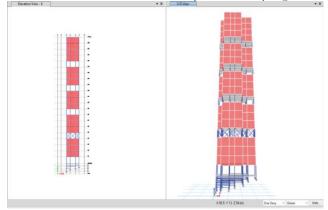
Elevation & 3D view of the building with bracing at 4th floor on 15° sloping ground
